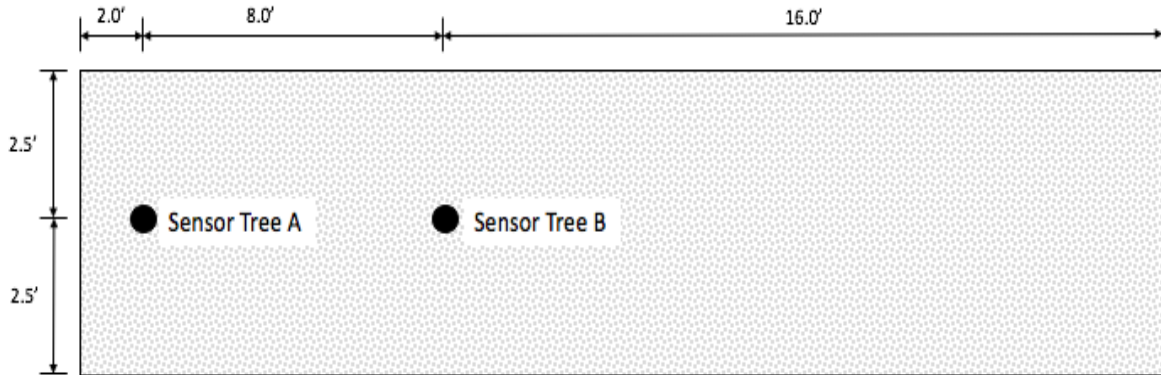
Location of sensor trees with respect to the PCP sidewalk boundaries – plan view
